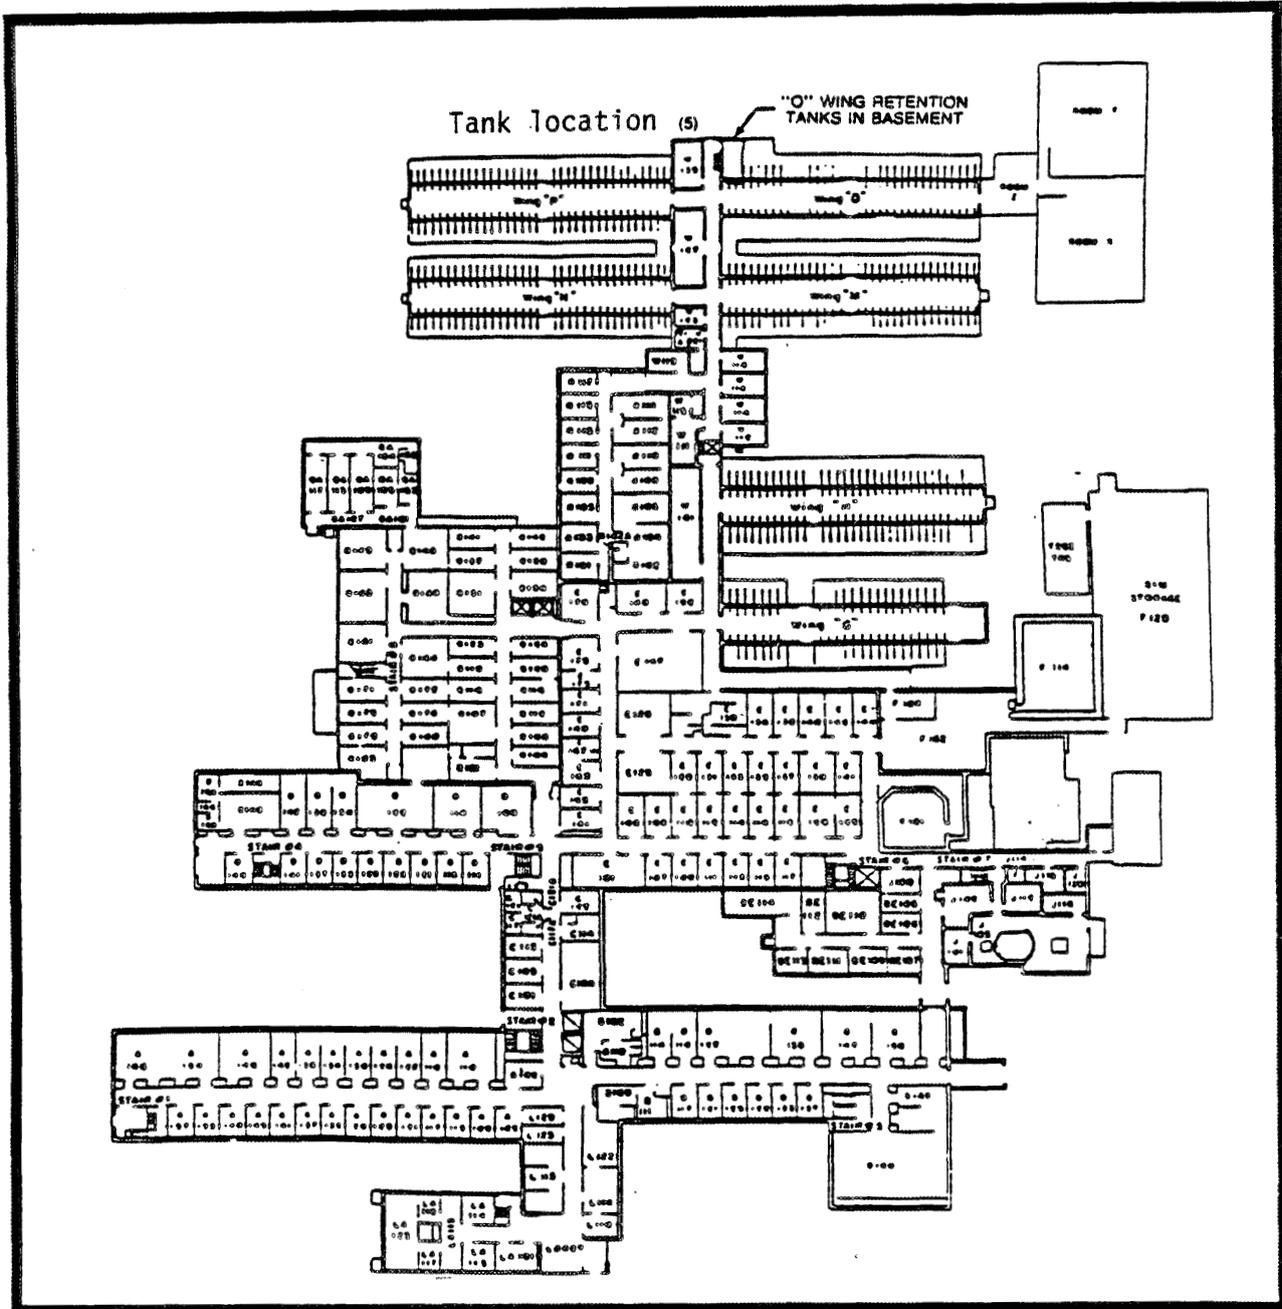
Waste Retention Tanks in Building 202: Main Floor
